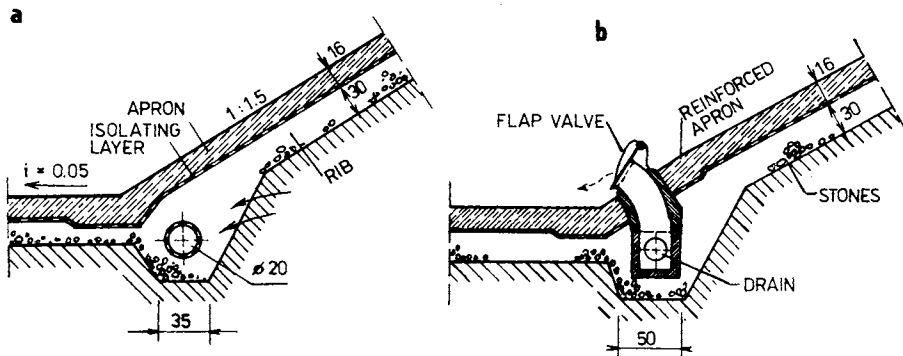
Relief drainage beneath the reinforced apron. a — cross-section. b — section in the place of the flap.
